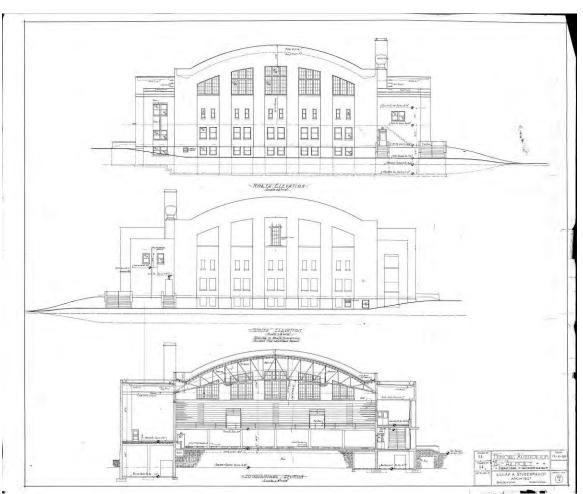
Elevations and Sections*. Edgar A. Stubenrauch, Architect. "Municipal Auditorium & Armory, Sheboygan, Wisconsin," Architectural Plans. 1940.
